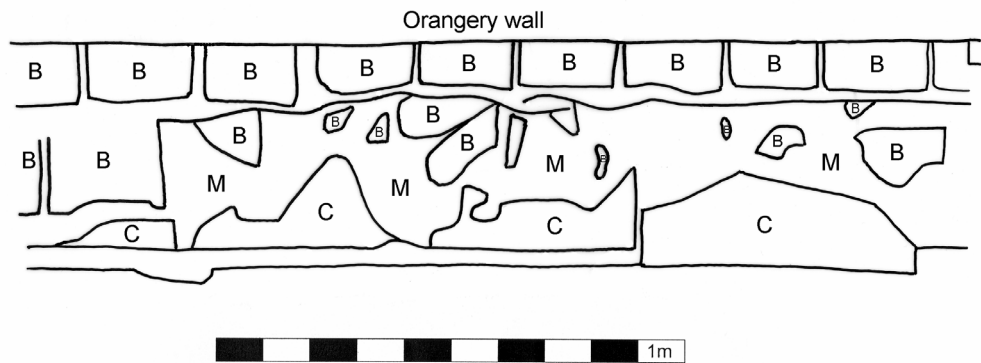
Plan of foundation [CT29] on the south side of the Orangery wall.
